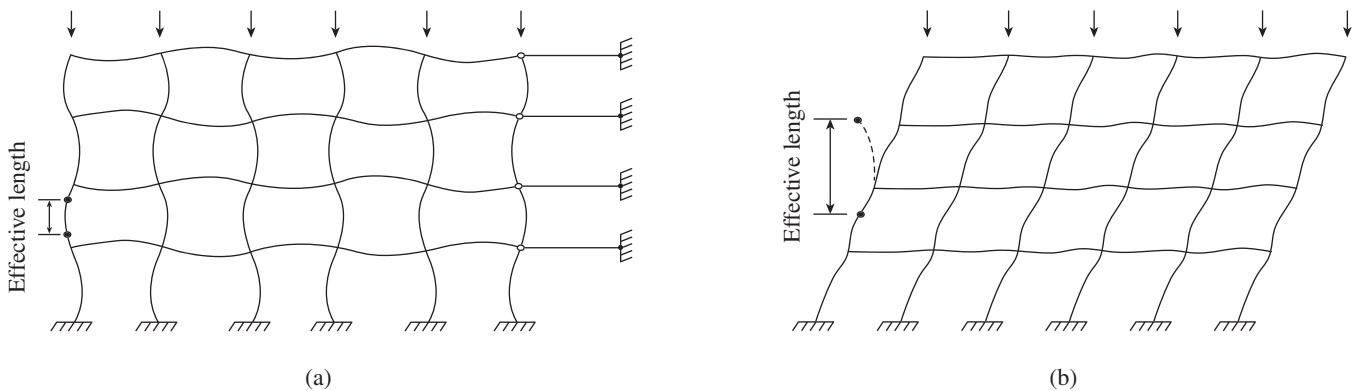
Buckling modes of braced and unbraced frames and the effective length concept (a) Braced frame (b) Unbraced frame
